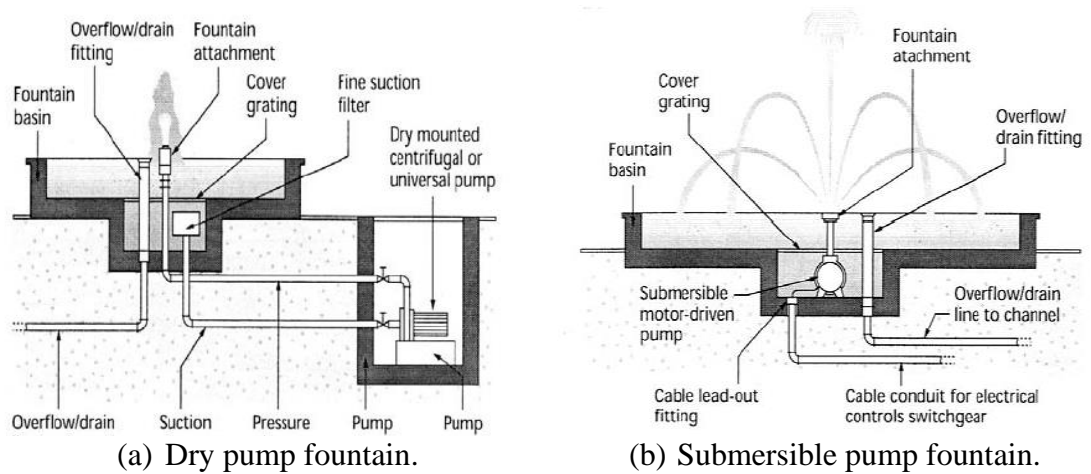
Typical fountain installations (CIBSE, 2004).
